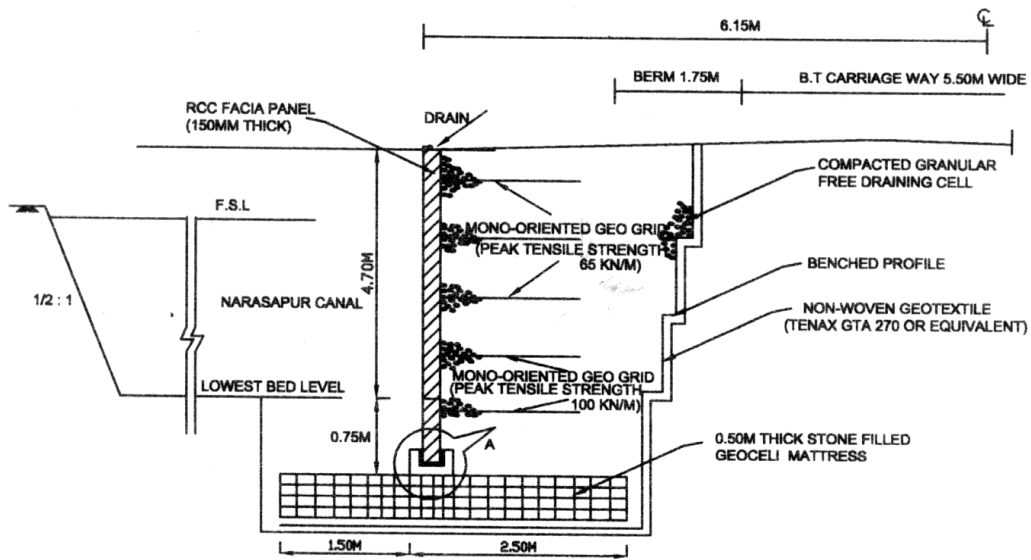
Typical cross section of retaining wall at Martair-Prakkilanka road
